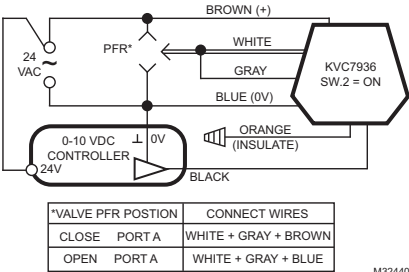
Wiring Color Code for Cable Models for Modulating (0-10V or 2-10V) Controller
